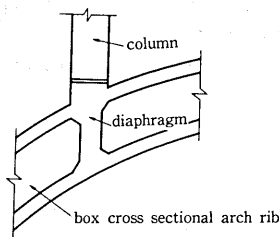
Diaphragm of box cross sectional arch rib
